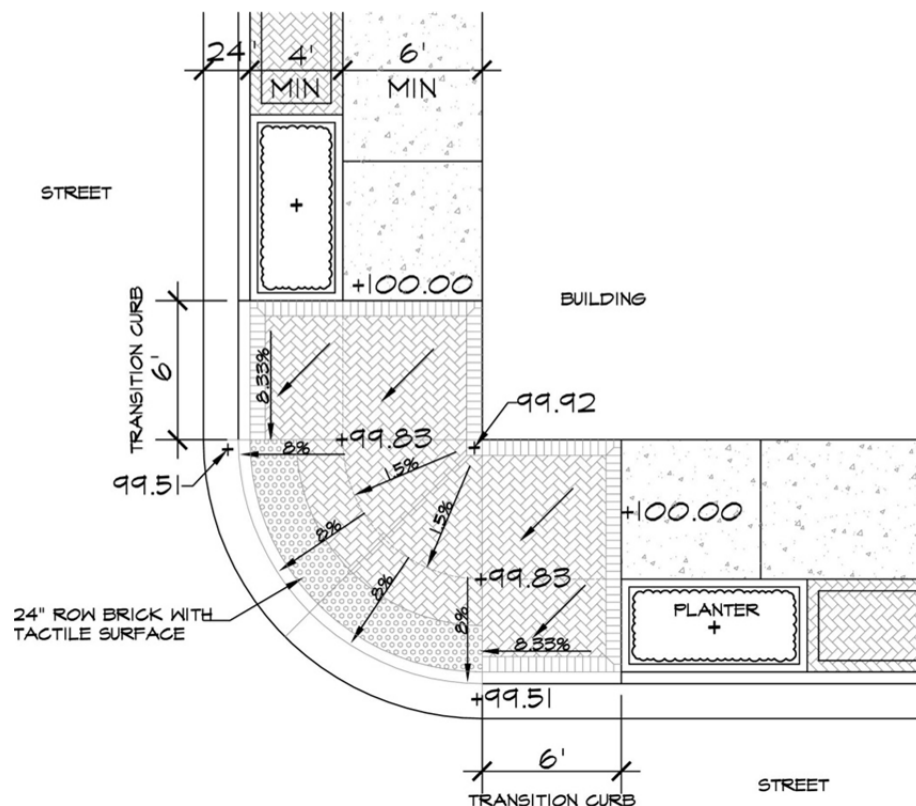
Typical Corner Ramping and Sidewalk Intersection Design
